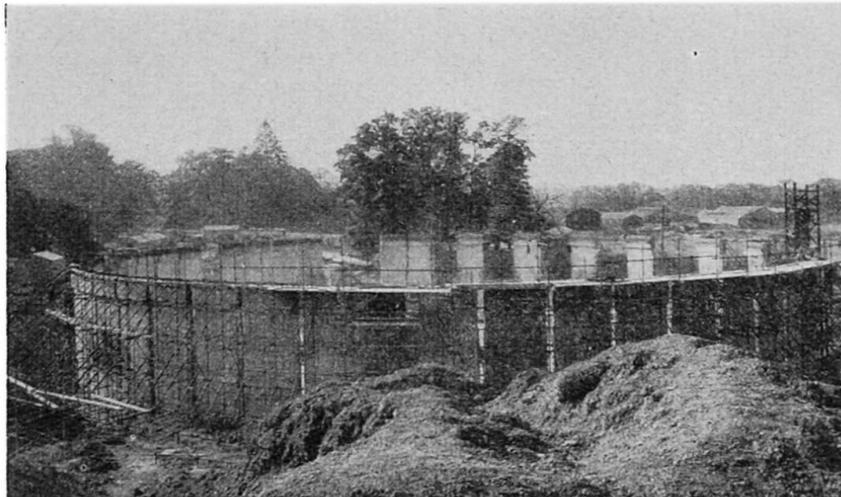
Precast concrete beam and column construction for Acton Lane Power Station.
